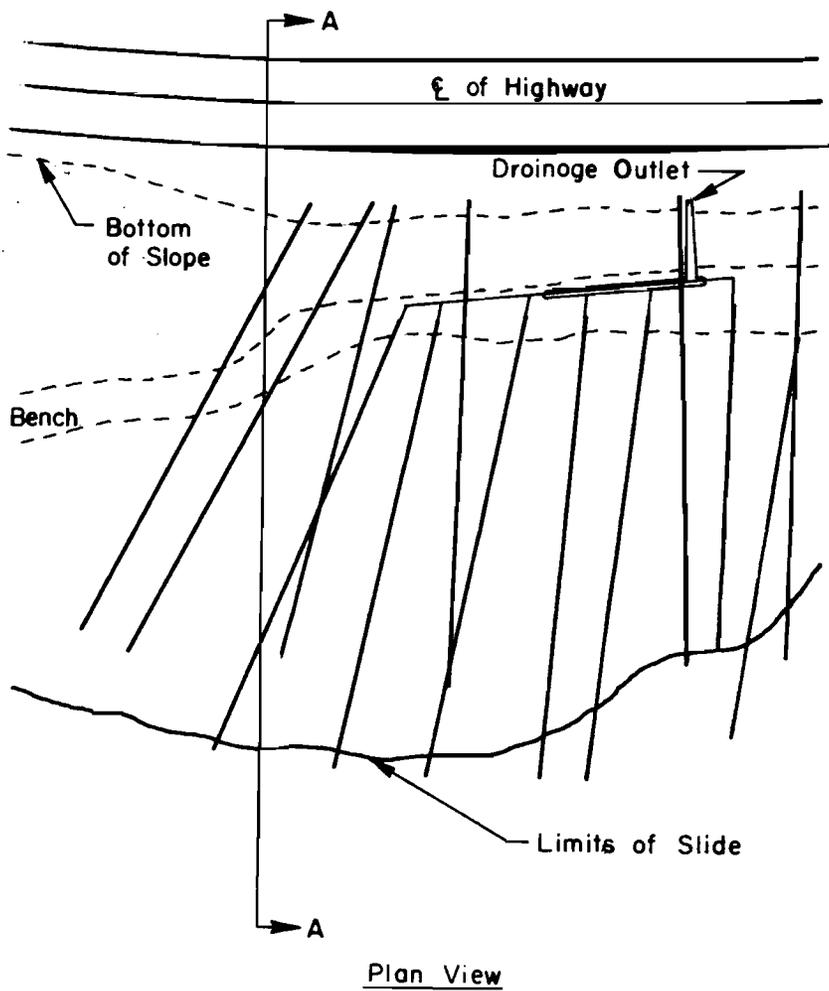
Plan view of slide area and horizontal drainage system - Willits Slide (Smith and Stafford, 1957).
